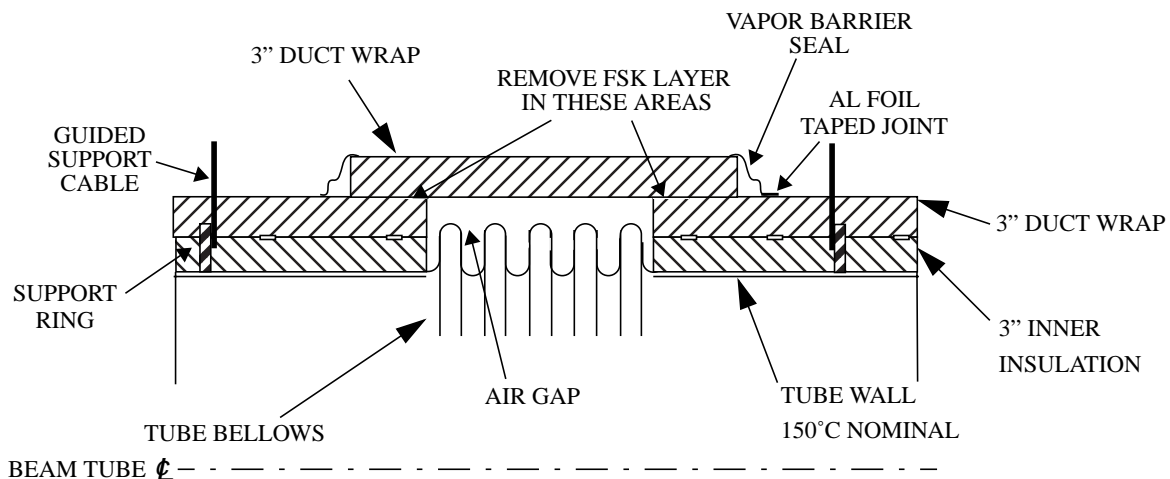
Schematic illustration of insulation installation at guided supports and bellows
